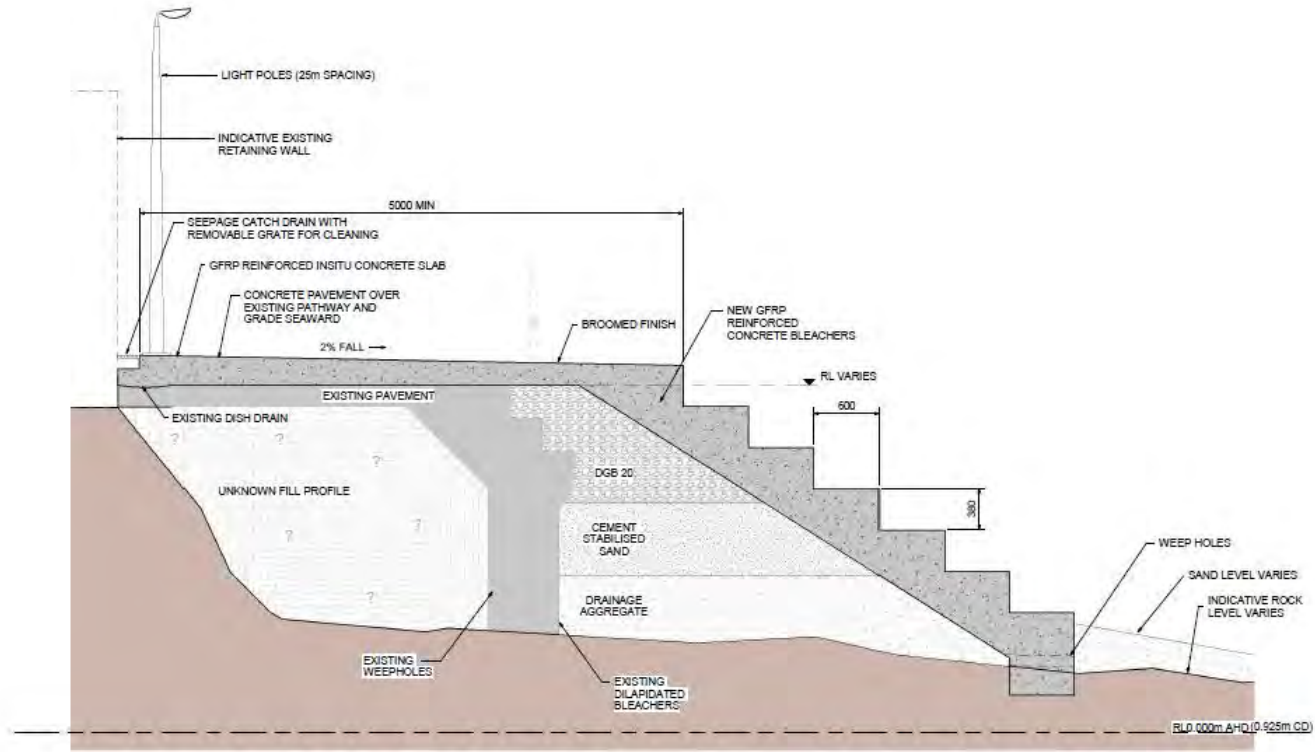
Option 3 - Widen Path with Bleachers, Access Ramps & Maintain Walkway Alignment – Section A
